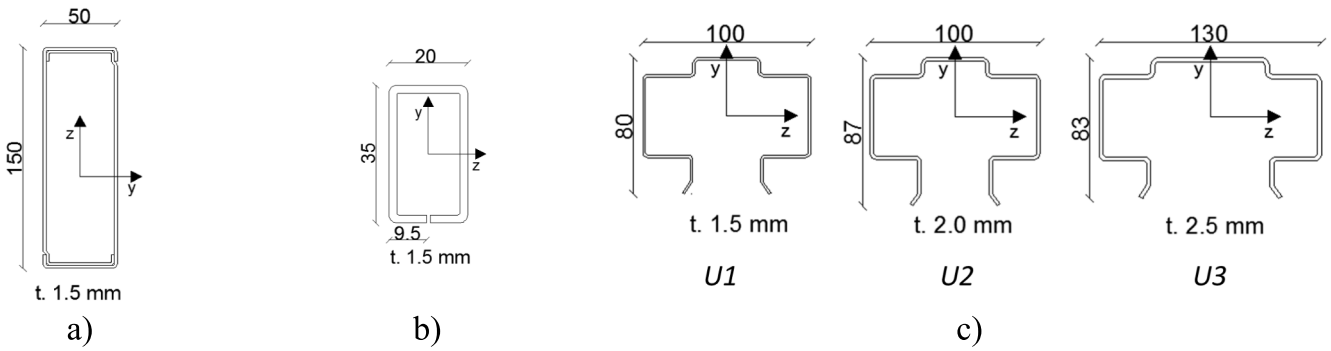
Cross sections of: (a) pallet beams; (b) diagonals/horizontal frame elements; (c) uprights.
